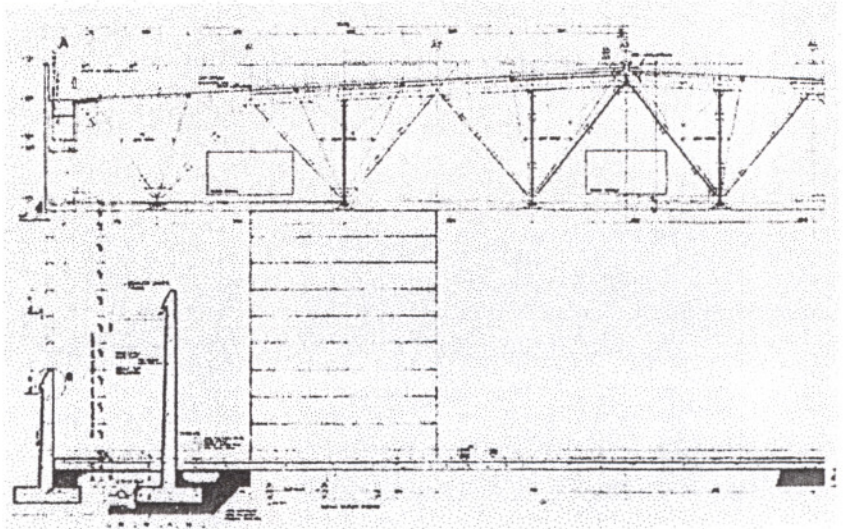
Göveçlik Factory, Bektaş, 1972; (source: Bektaş 1979)
